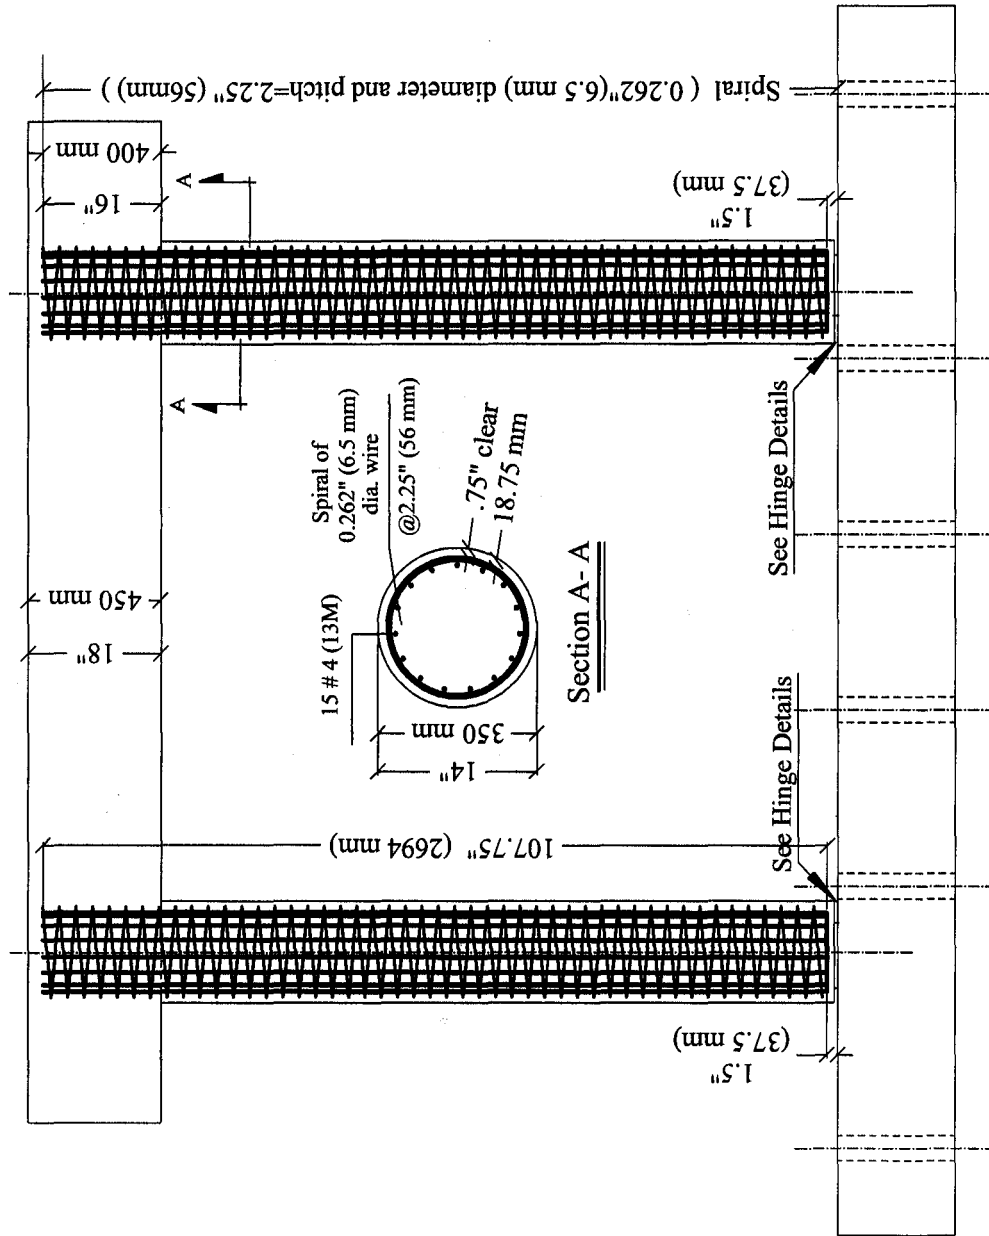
Columns Longitudinal and Transverse Reinf. of Specimen B2CT
